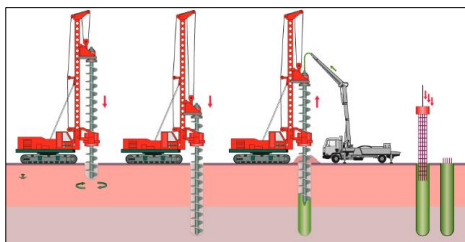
Illustration of work sequence of bore pile foundation (source: <https://www.arsitur.com/2017/10/pengetahuan-pondasi-bored-pile-dan.html>)
